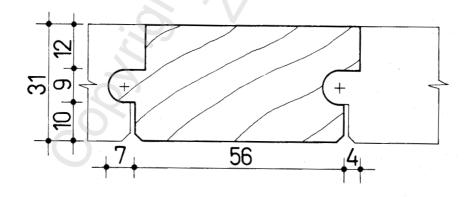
75 mm x 40 mm TONGUE AND GROOVE SECRET NAIL FLOORING (full size)
